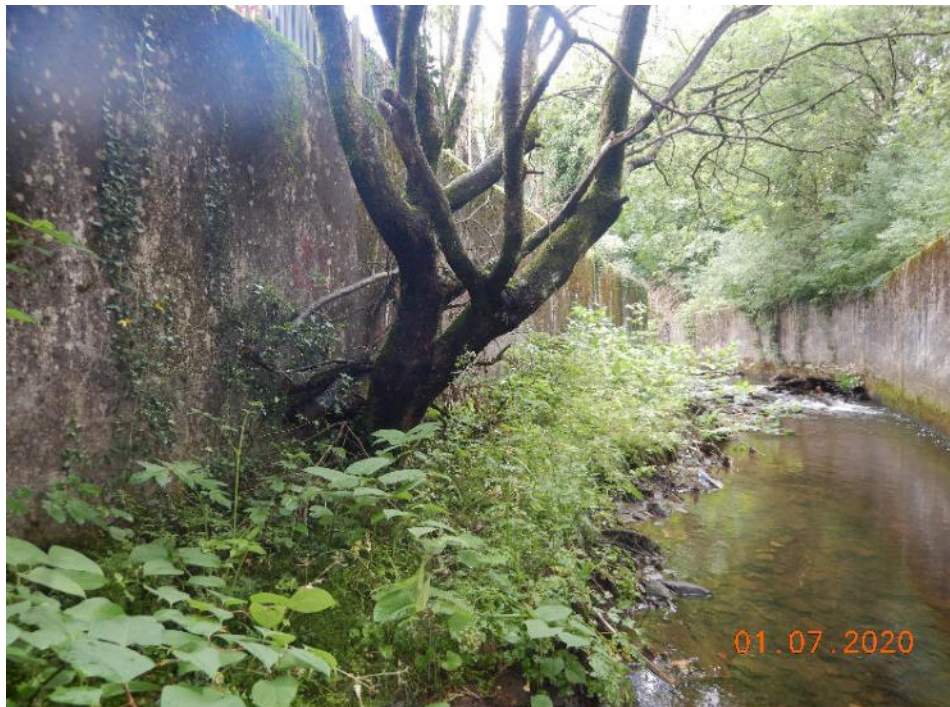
General view of the concrete retaining wall (320.5m – 413m)
